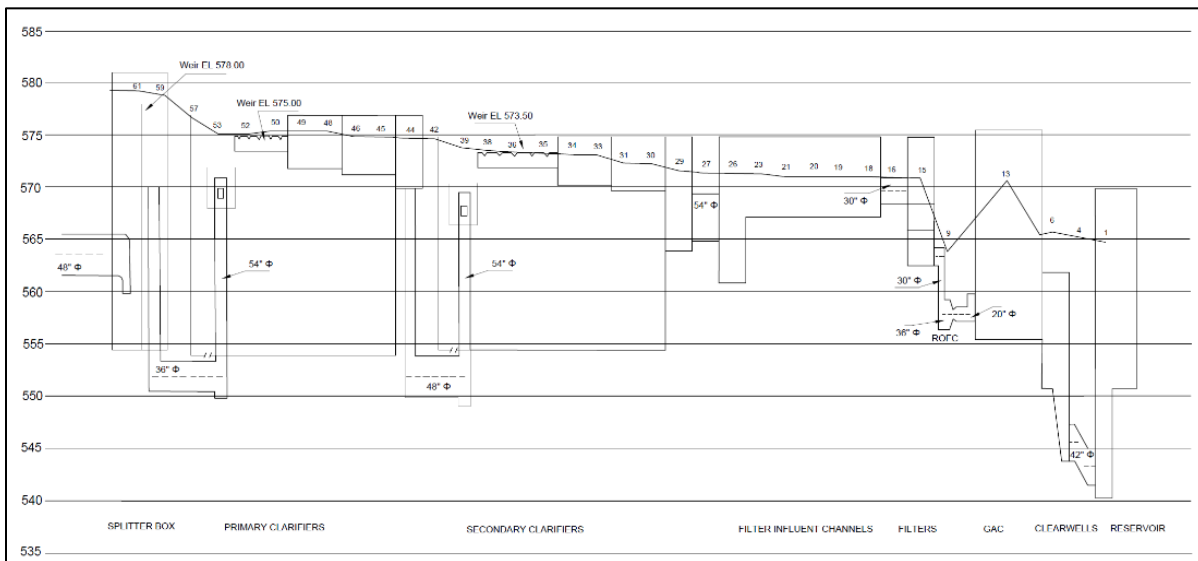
Hydraulic Grade Line with GAC Forefront Consulting Drawing Set Page 19, Appendix 9.6
